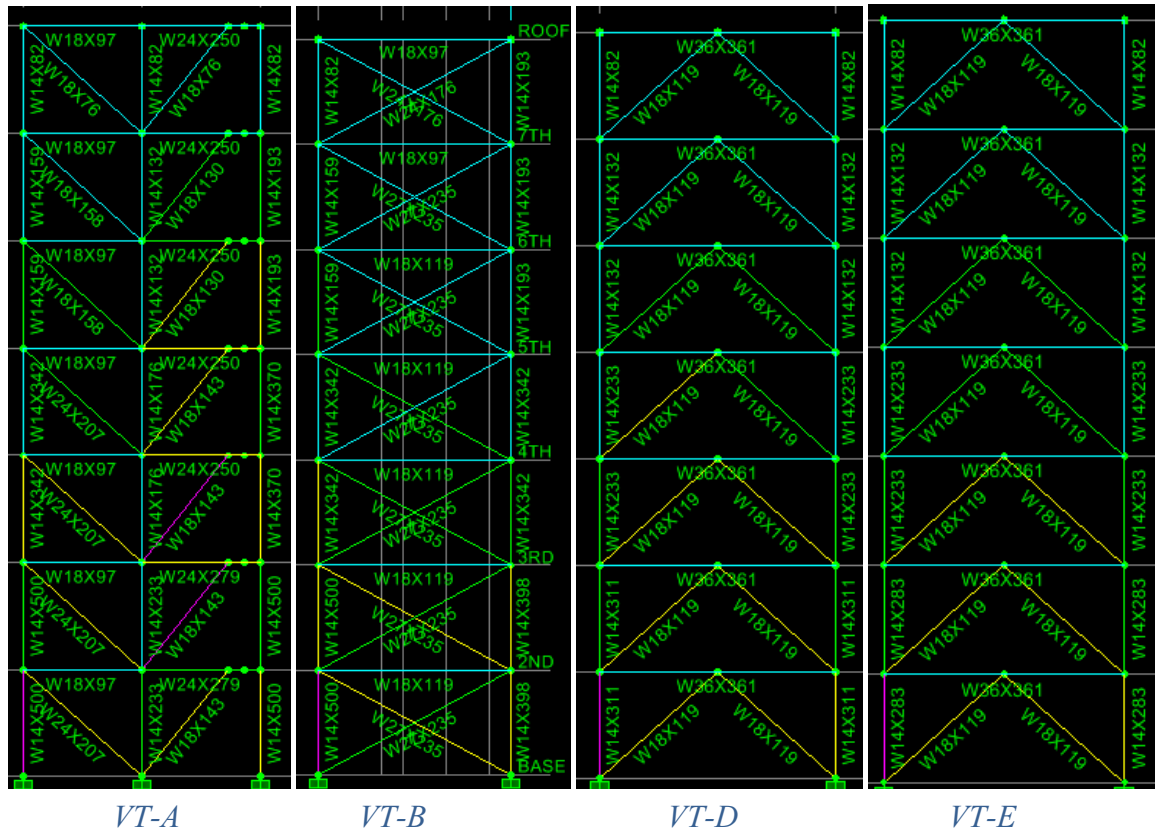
Vertical Truss Elevations Under Controlling Loads
